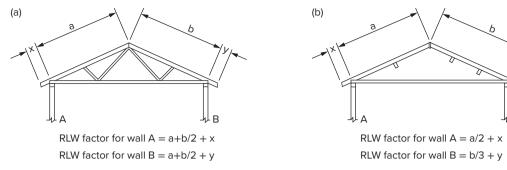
Roof load width (RLW): (a) trussed roof; (b) coupled roof with underpurlins
